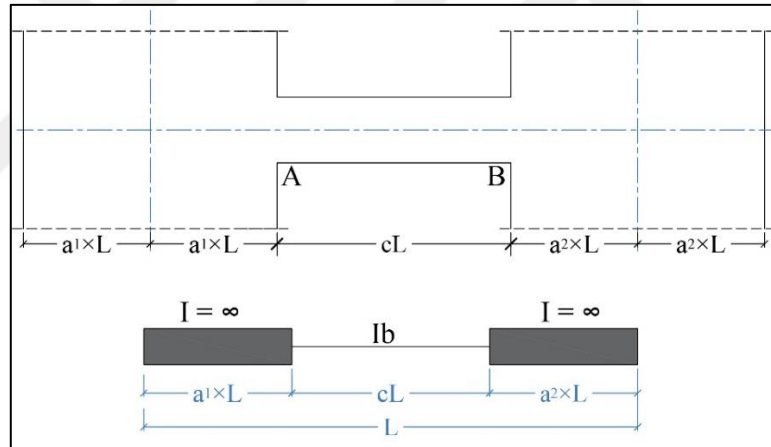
Coupled Beam Connected Between Two Shear Walls.
